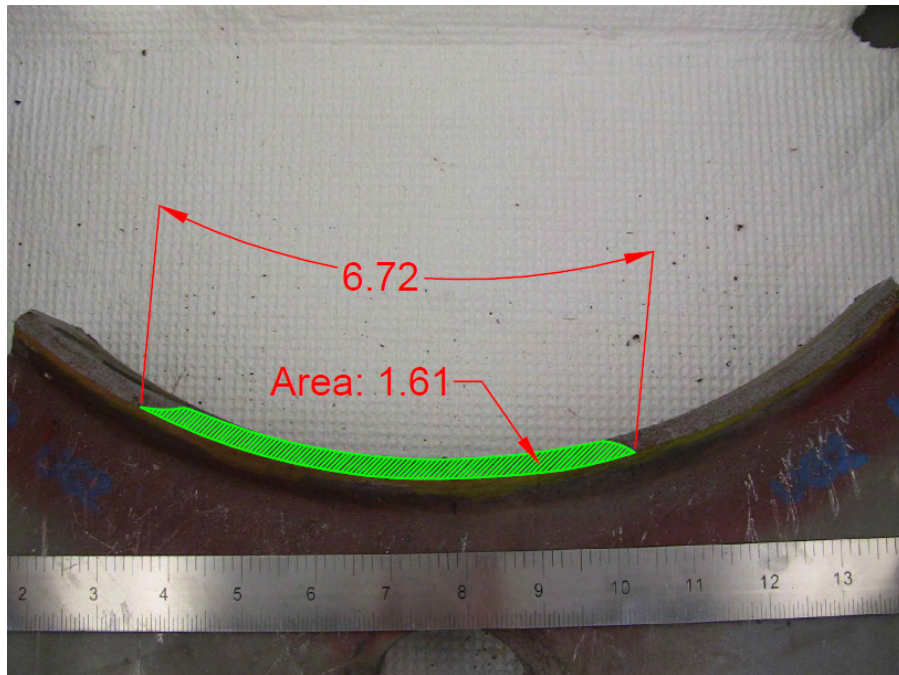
Photo. Specimen 1U4 fracture surface.
